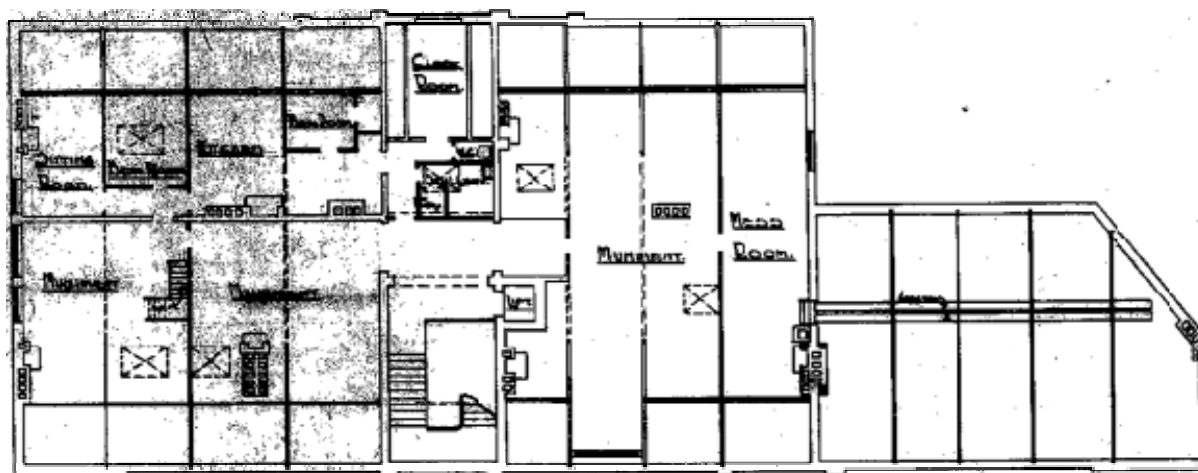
1904 third floor plan of Kings House (N is to the right)
